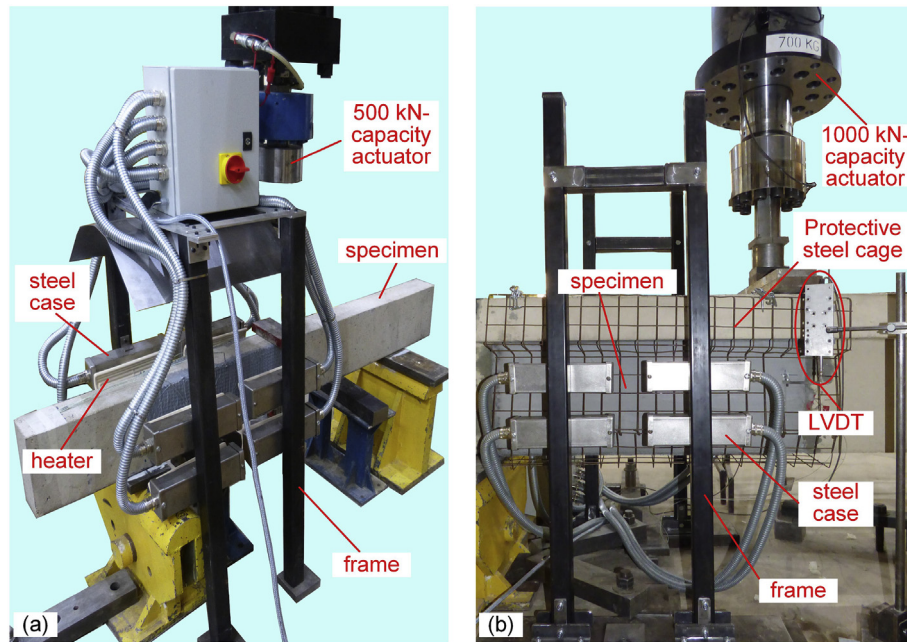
(a) Test set-up and heating system of medium-scale rectangular beams; (b) Test set-up and heating system of full-scale T-beams.
